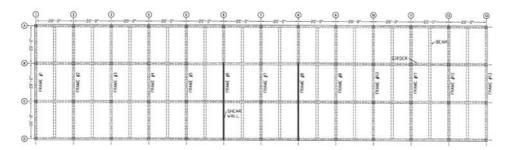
Solid diaphragm plan with intermediate walls (Case 3)
